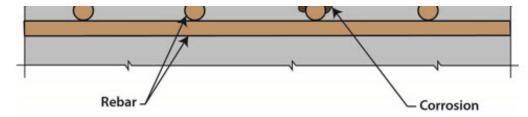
Typical Reinforced Concrete Deck and Slab Deterioration
